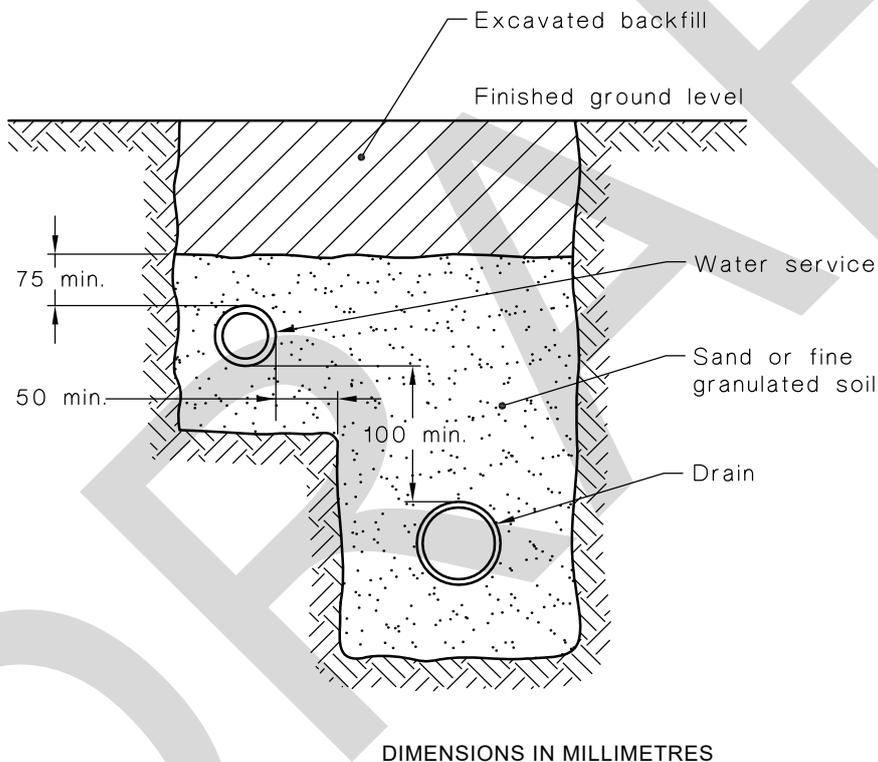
TYPICAL SHARED TRENCH
